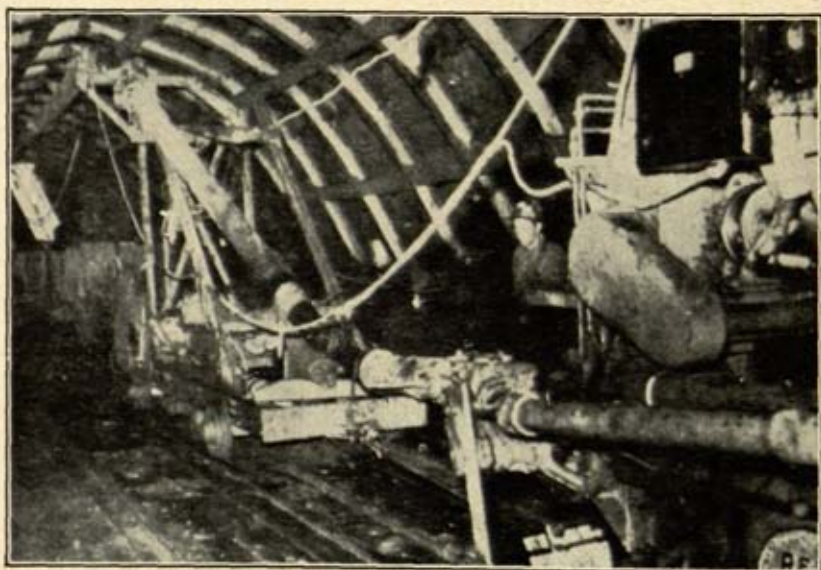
Pumperete machine mounted on wheels to facilitate placing concrete in a tunnel. (Chain Belt Co.)
